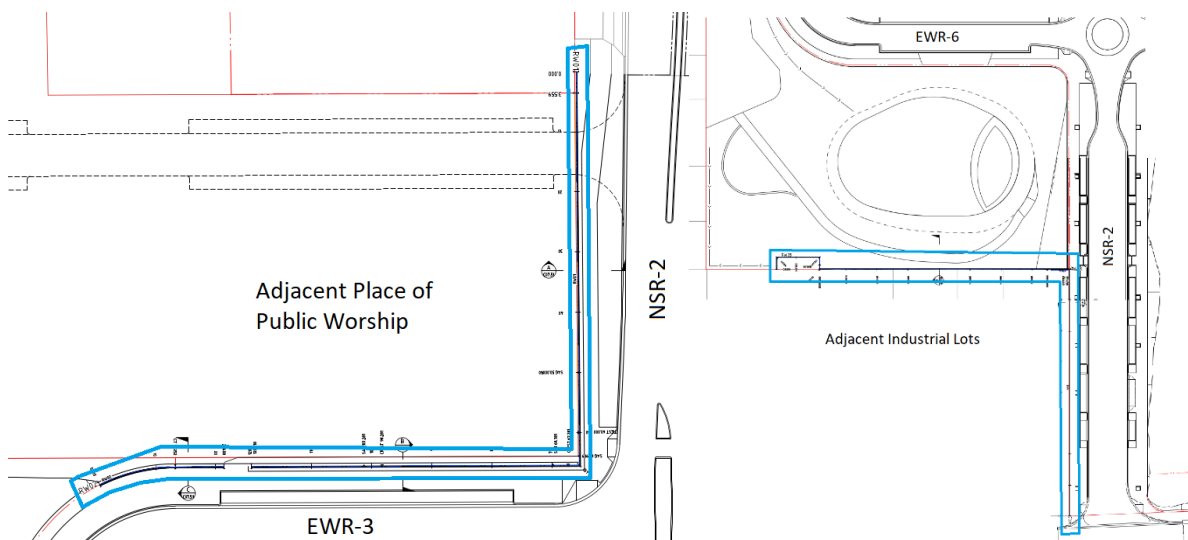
Retaining walls RW01 and RW02 (left) and RW03 and RW05 (right).
